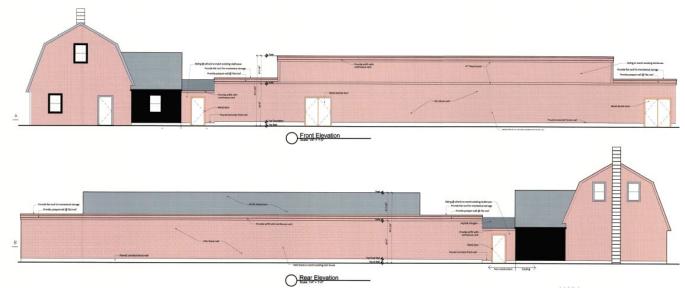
Snippet of approved elevations from SPR-01-13, Mod. 2
